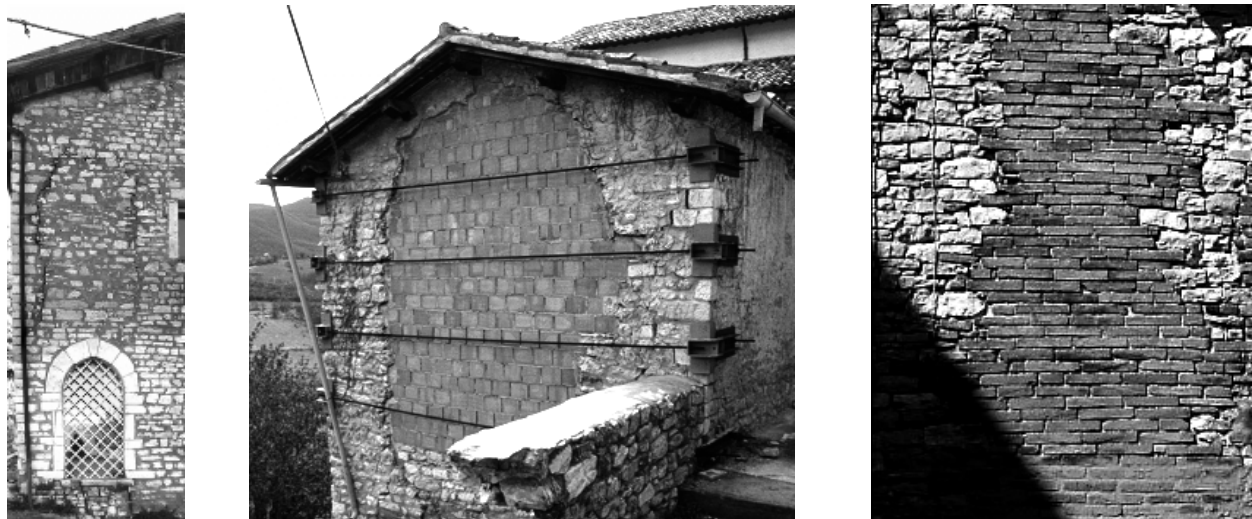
Masonry replacement intervention. The repairs are ineffective due to the lack of compatibility between the masonry portions (source: POLIMI).
